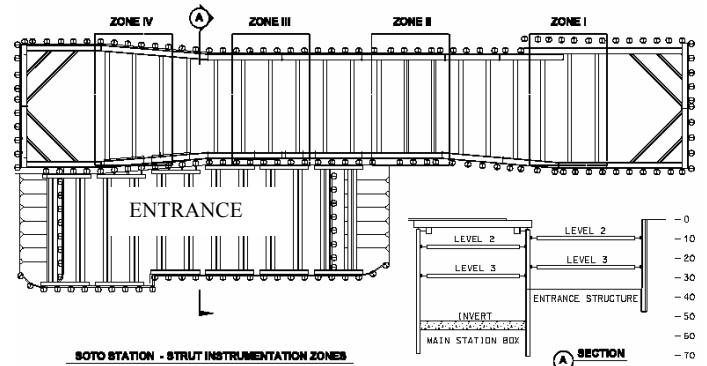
Soto Station bracing layout and section through mezzanine/entrance excavation
